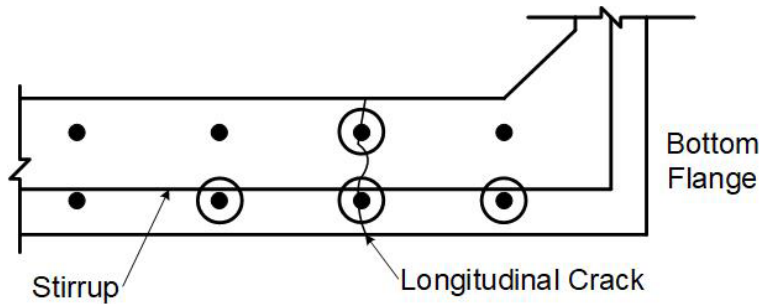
Adjacent Prestressing Strands and Shear Reinforcement Corrosion
